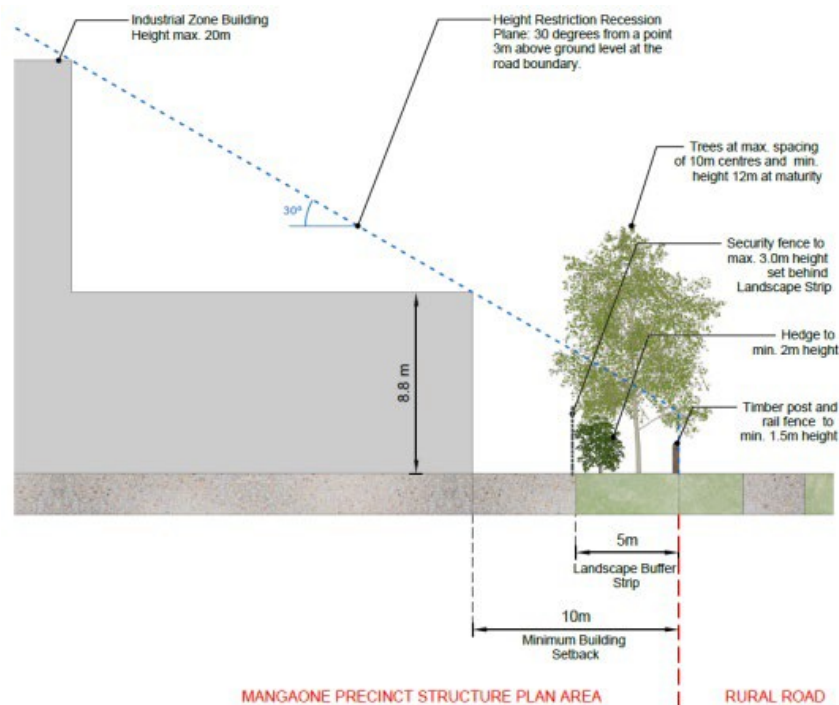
Building setback adjoining Swayne or Zig Zag Road
